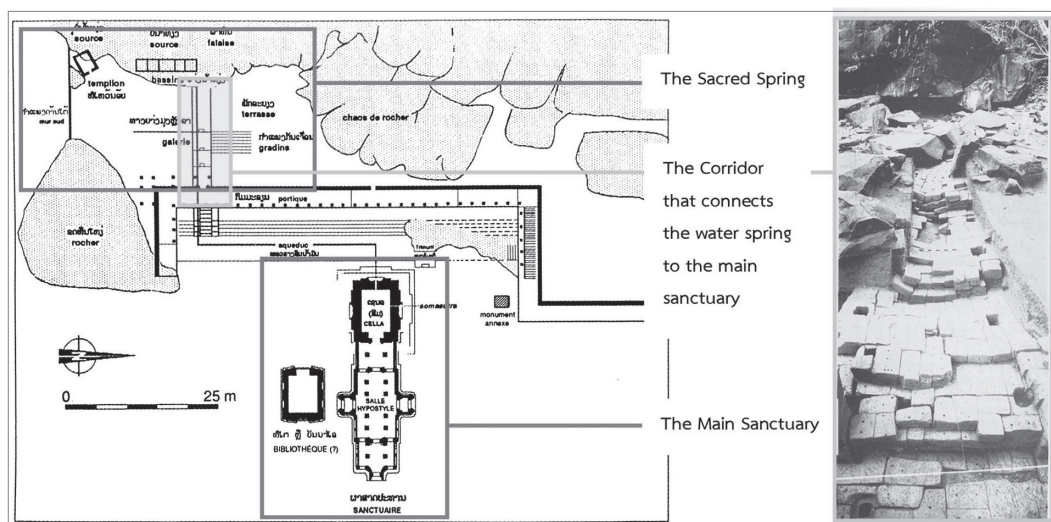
The plan and detail of the landscape architectural design of Vat Phou Sanctuary
